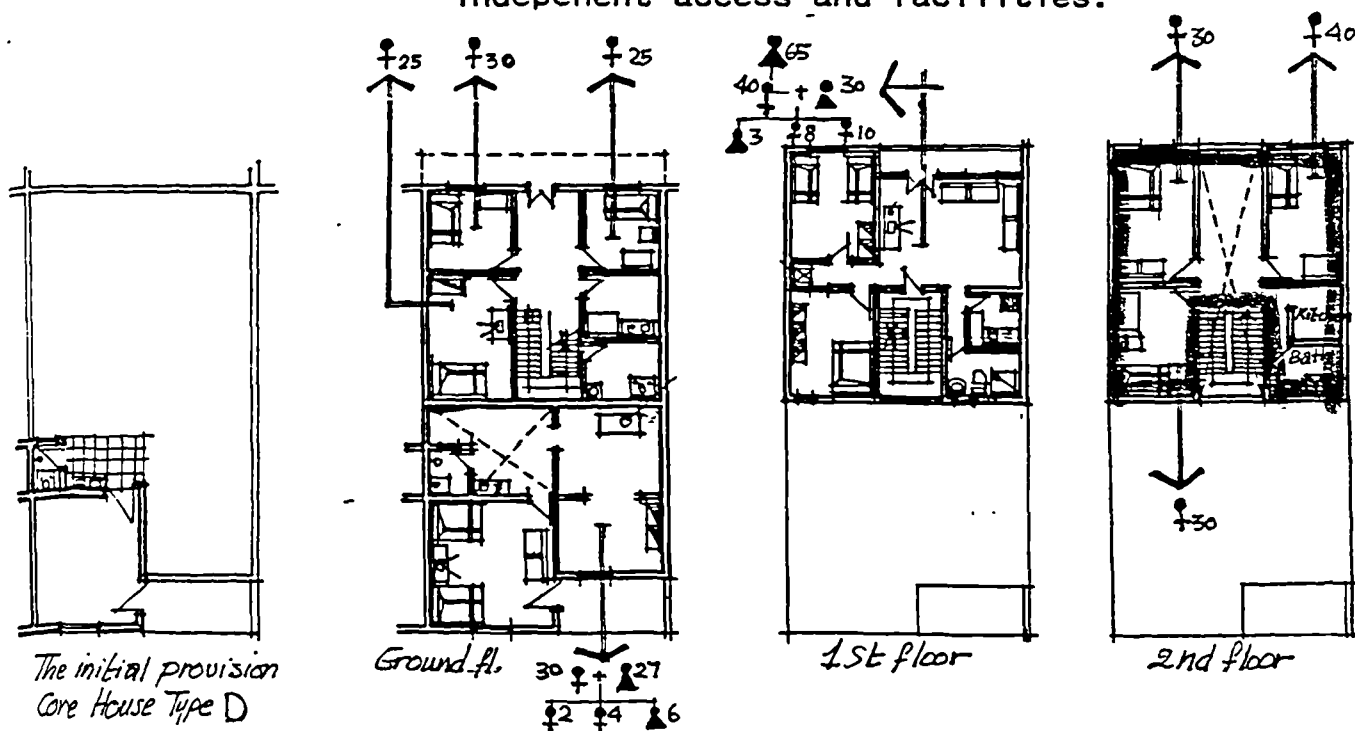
Group B Houses of more than 6 rooms with independent access and facilities.
